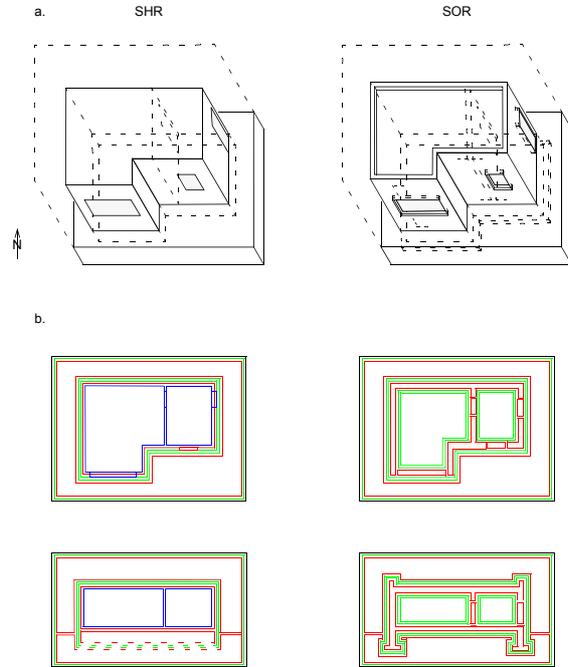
Example studio. a. axonometric view. b. floor plan and cross section (nested view).
